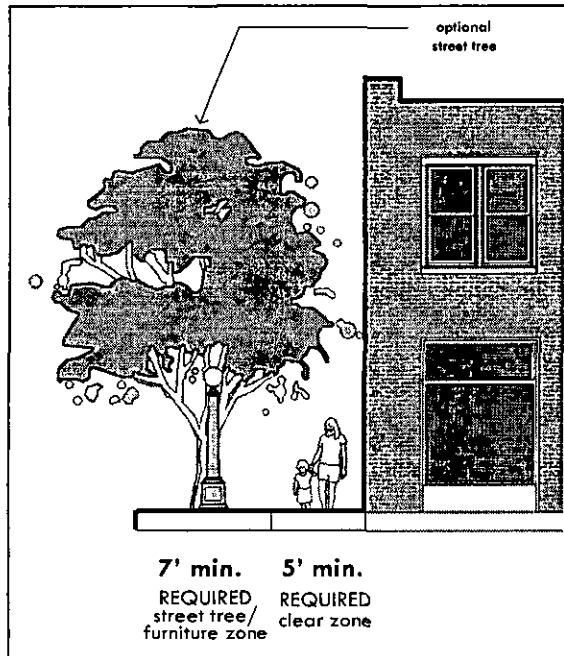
Urban roadway sidewalk width requirements. Note that street trees are optional on urban roadways.
